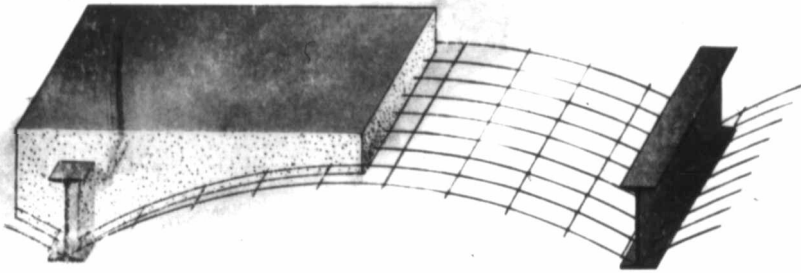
shows a heavy construction with spans of 6 feet centre to centre.
